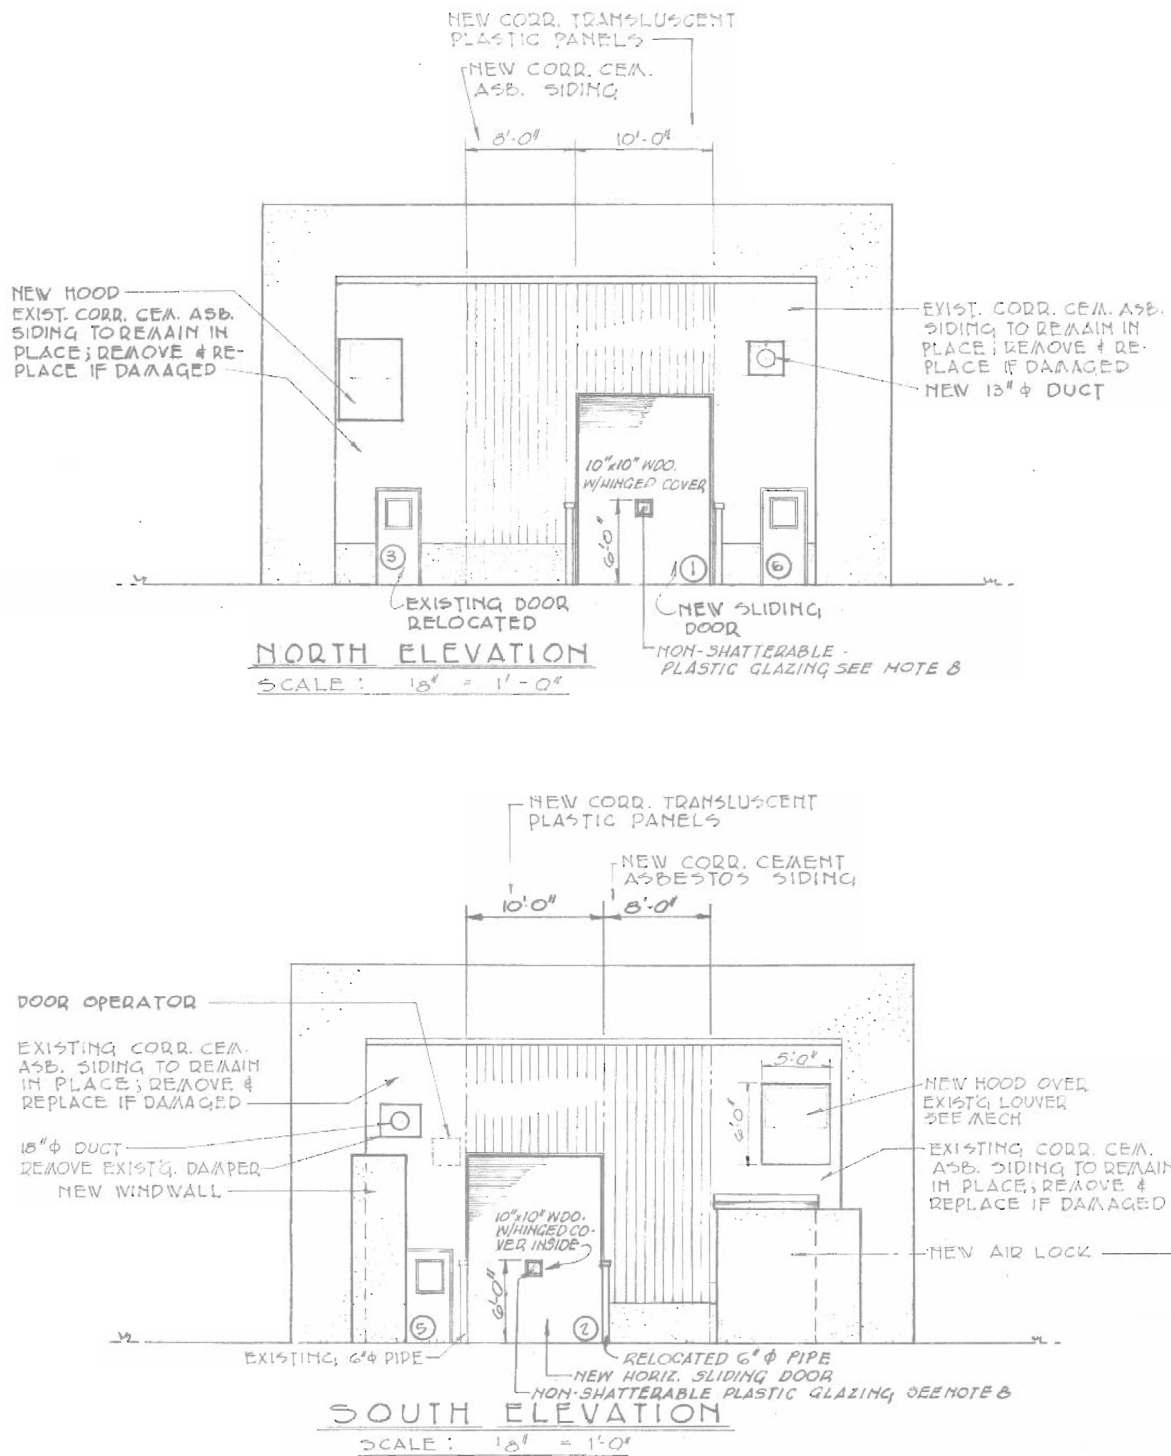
Property 23656, alterations to north and south elevations from 1962 WS-KR plans.
